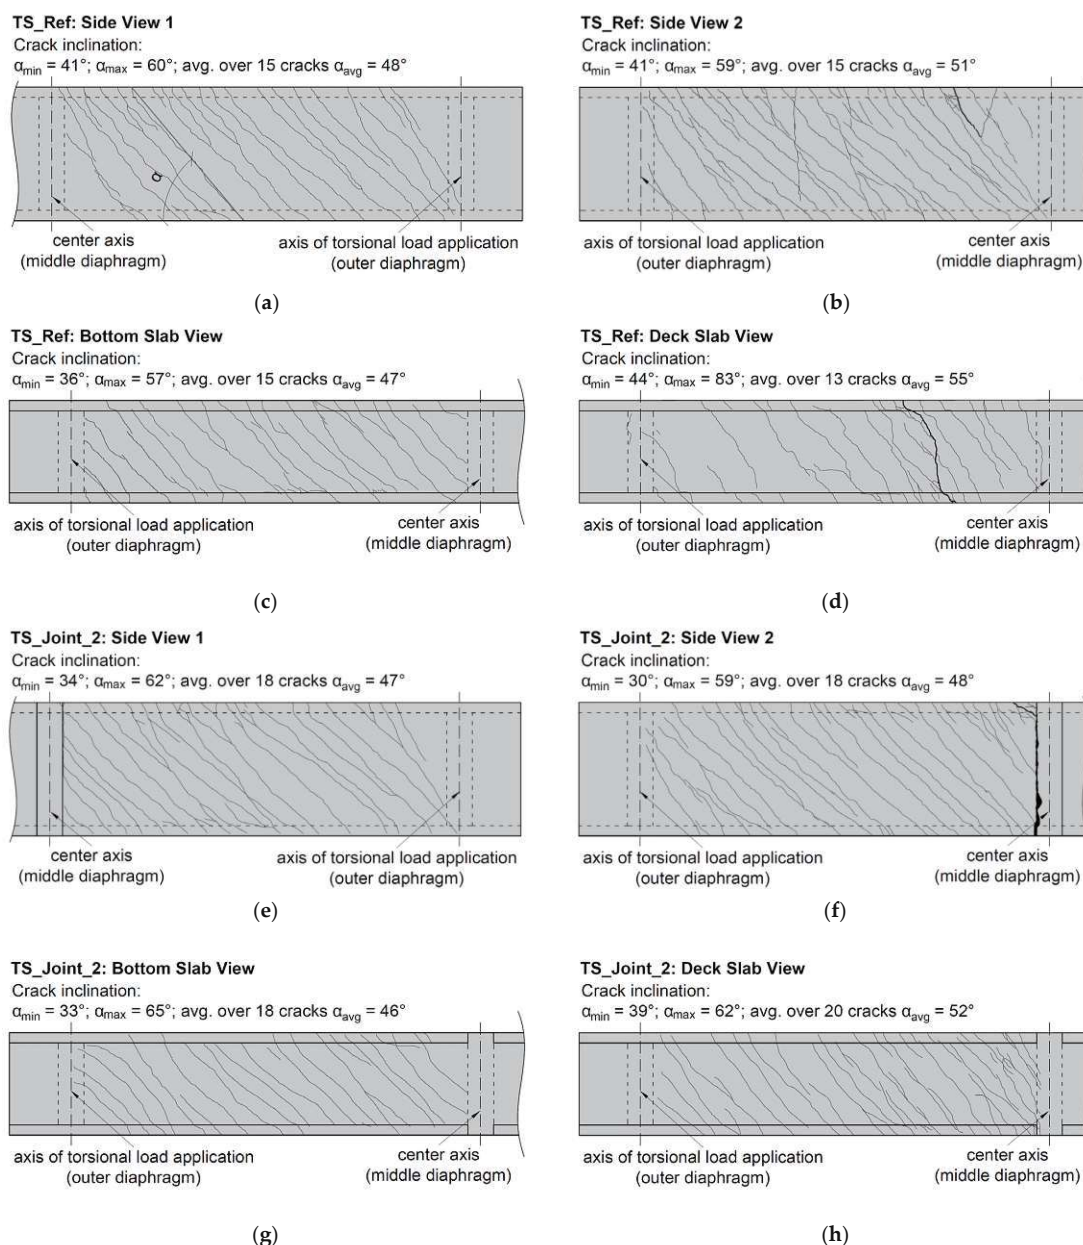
Crack patterns for TS_Ref and TS_Joint_2: (a) TS_Ref, side view 1; (b) TS_Ref, side view 2; (c) TS_Ref, bottom slab view; (d) TS_Ref, deck slab view; (e) TS_Joint_2, side view 1; (f) TS_Joint_2, side view 2; (g) TS_Joint_2, bottom slab view; (h) TS_Joint_2, deck slab view.
